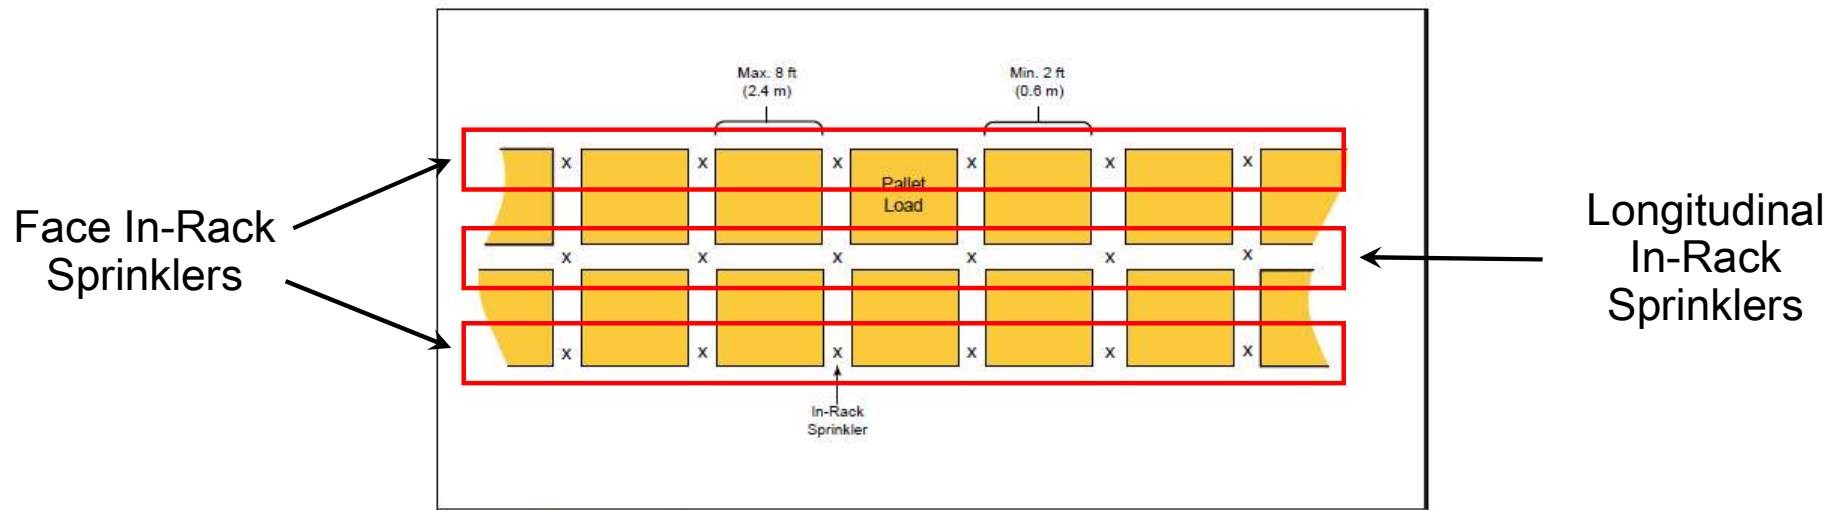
Plan view of IRAS(E) horizontal in-rack sprinkler arrangement for double-row racks (face and flue)
